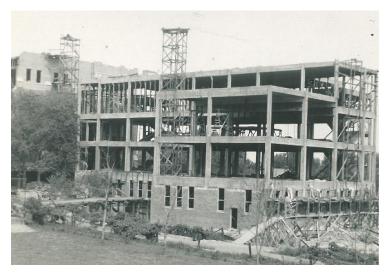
Photo J: The college wing construction as viewed from our current soccer field. Notice the work on the chapel 4th floor and roof.
